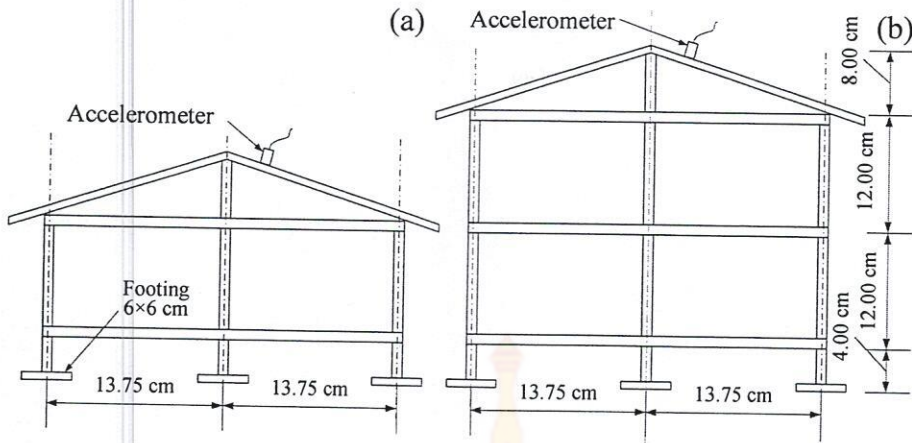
10 Elevation drawings for one-storey house (a) two-storey house (b)
